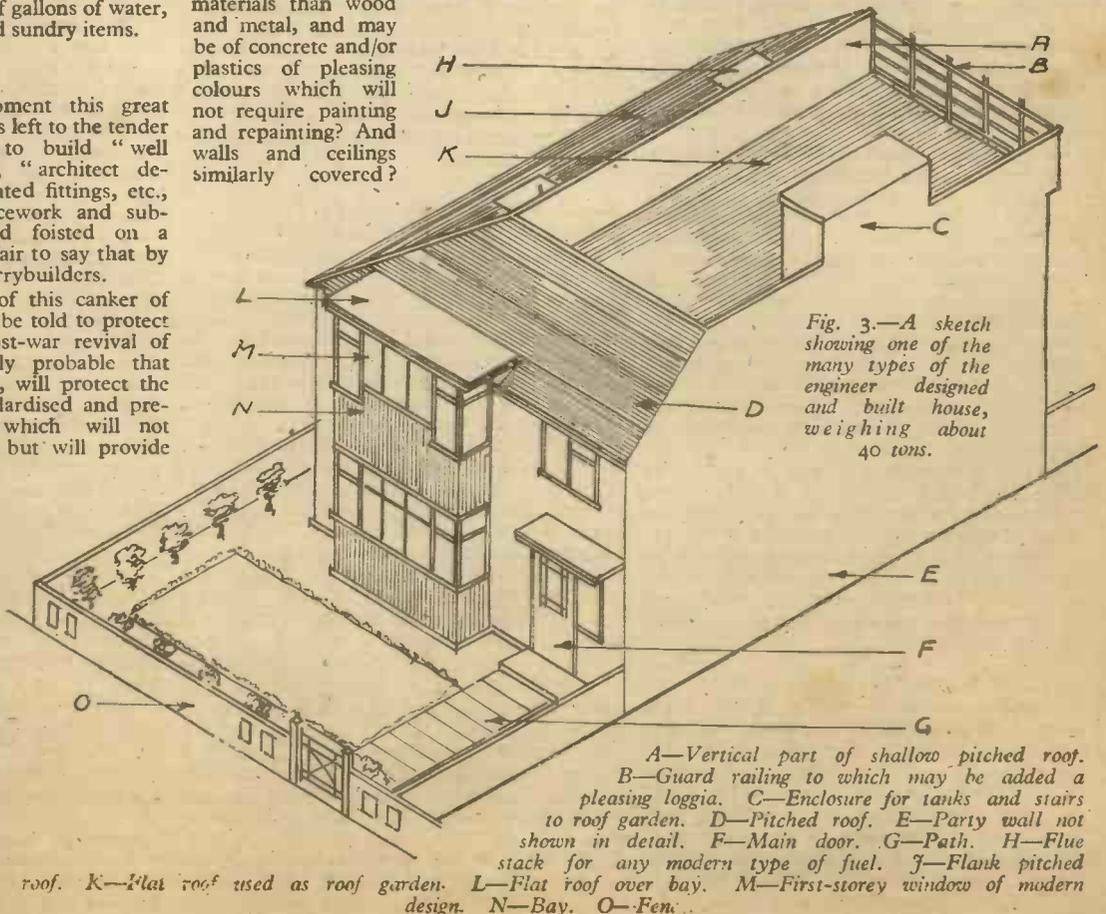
A sketch showing one of the many types of the engineer designed and built house, weighing about 40 tons.
